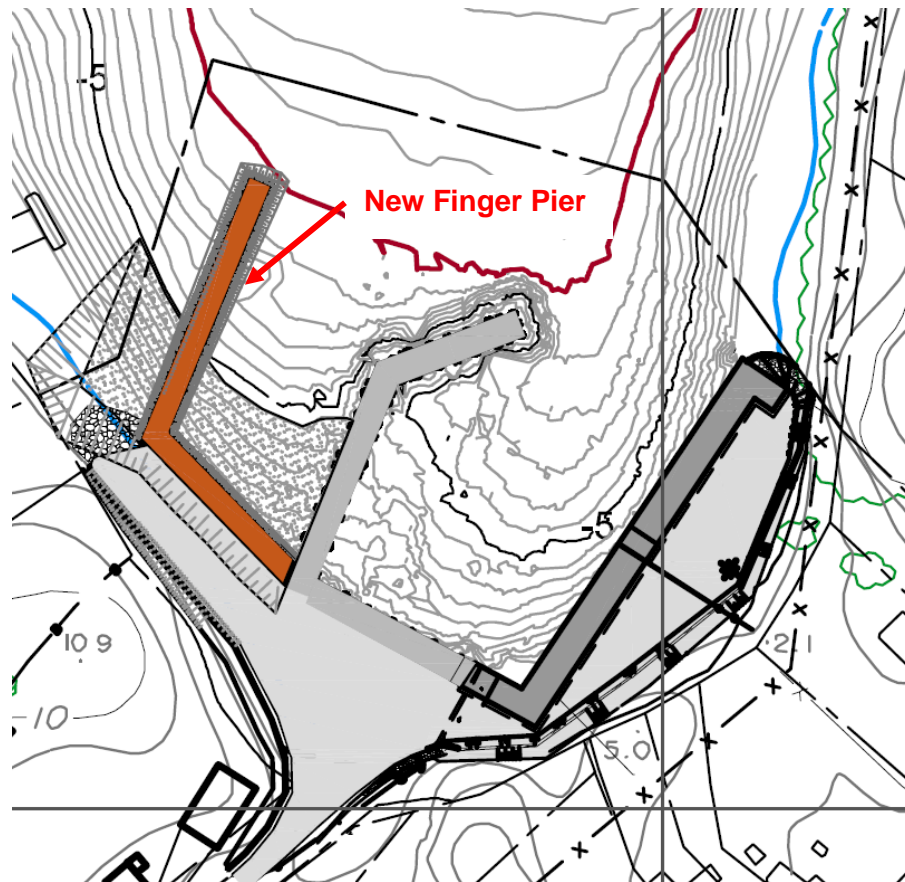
Additional berthing space provided by new figure pier at existing Small Craft Harbours site west of Sheep's Head.
